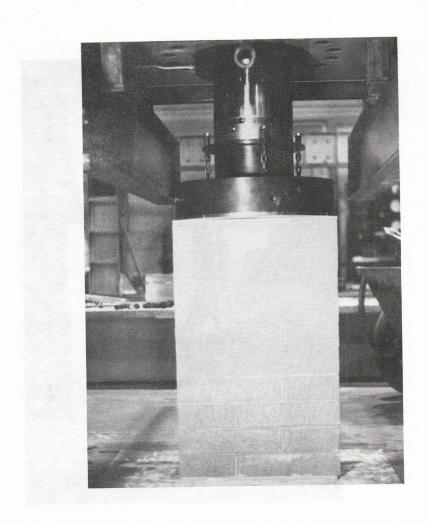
MONARCH SPECIMEN PRIOR TO TESTING
